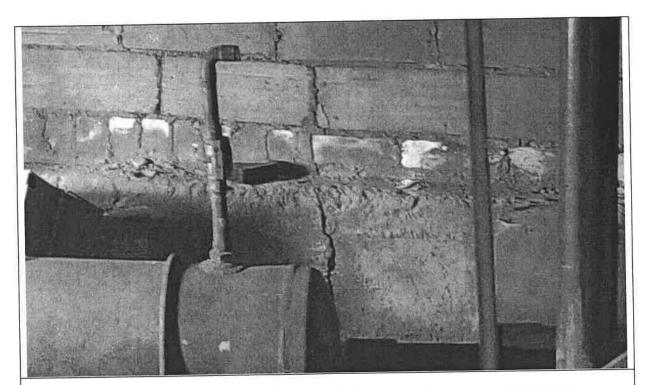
Inside face of concrete foundation for East Exterior Wall: Note large vertical crack in concrete foundation propagates into terra cotta masonry.
